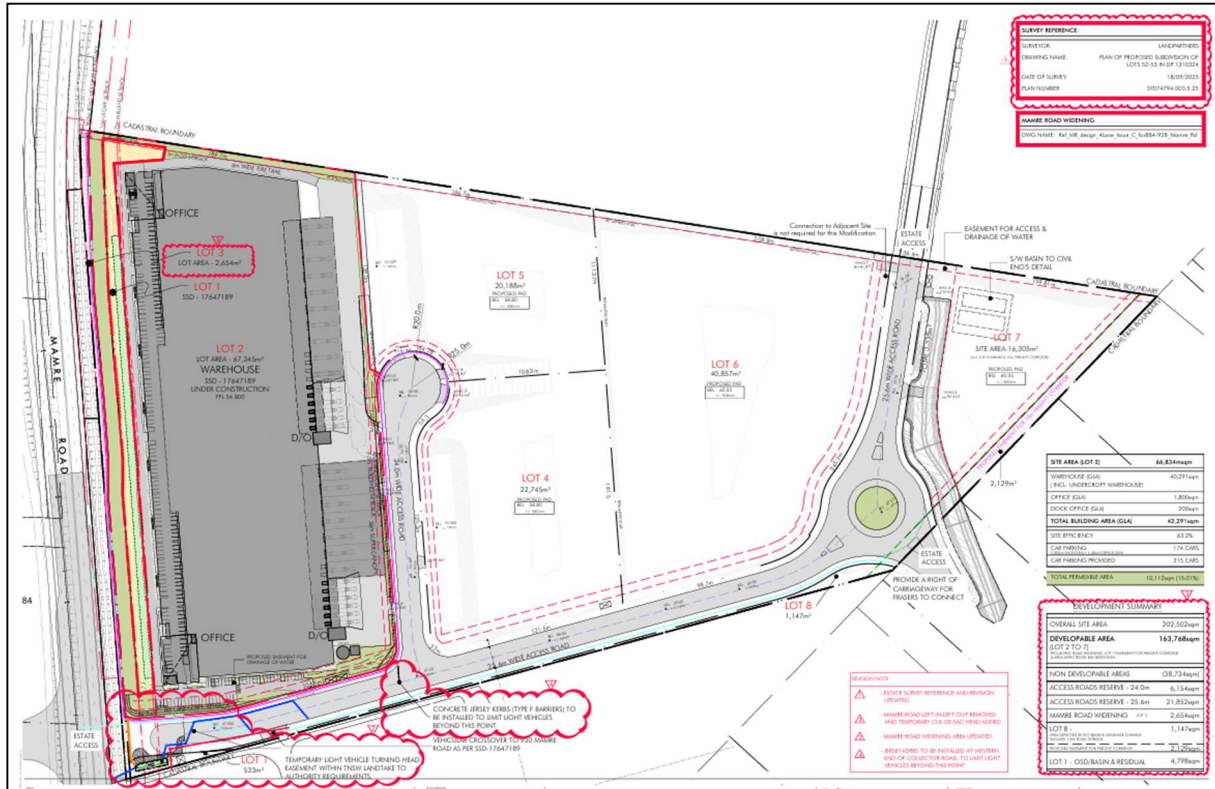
Stage 2 Estate Master Plan / Benching Plan (Source: Nettletontribe Architects, 2026)
